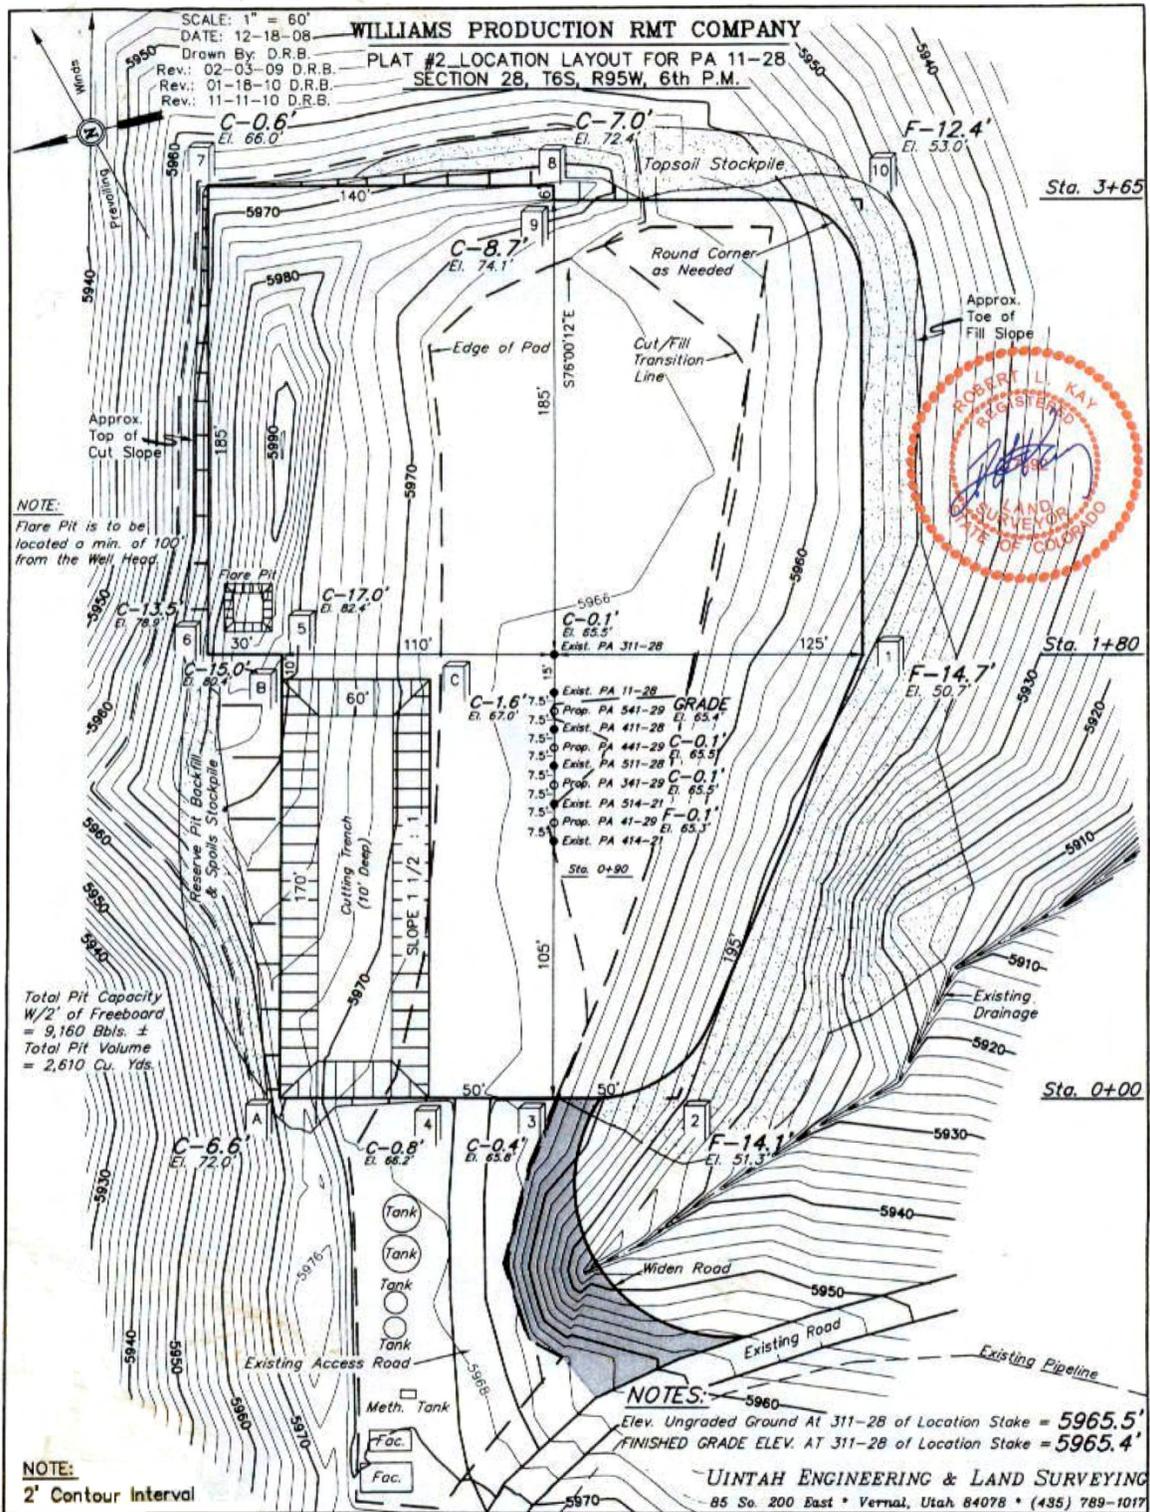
Construction Layout, PA 11-28 Pad Expansion
